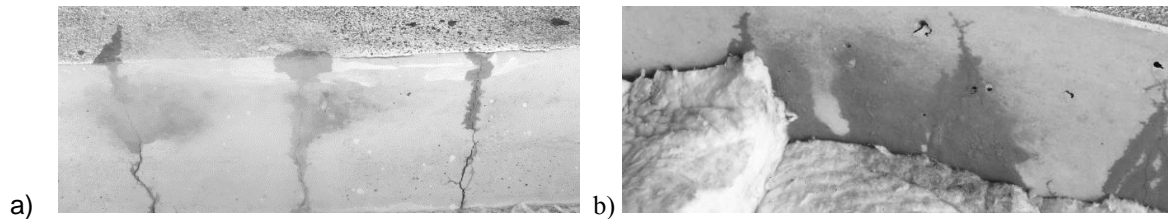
a) the water evaporating through cracks created at the sides of the slab – spalling continues; b) water flowing out of cracks as boiling liquid – spalling stops.
